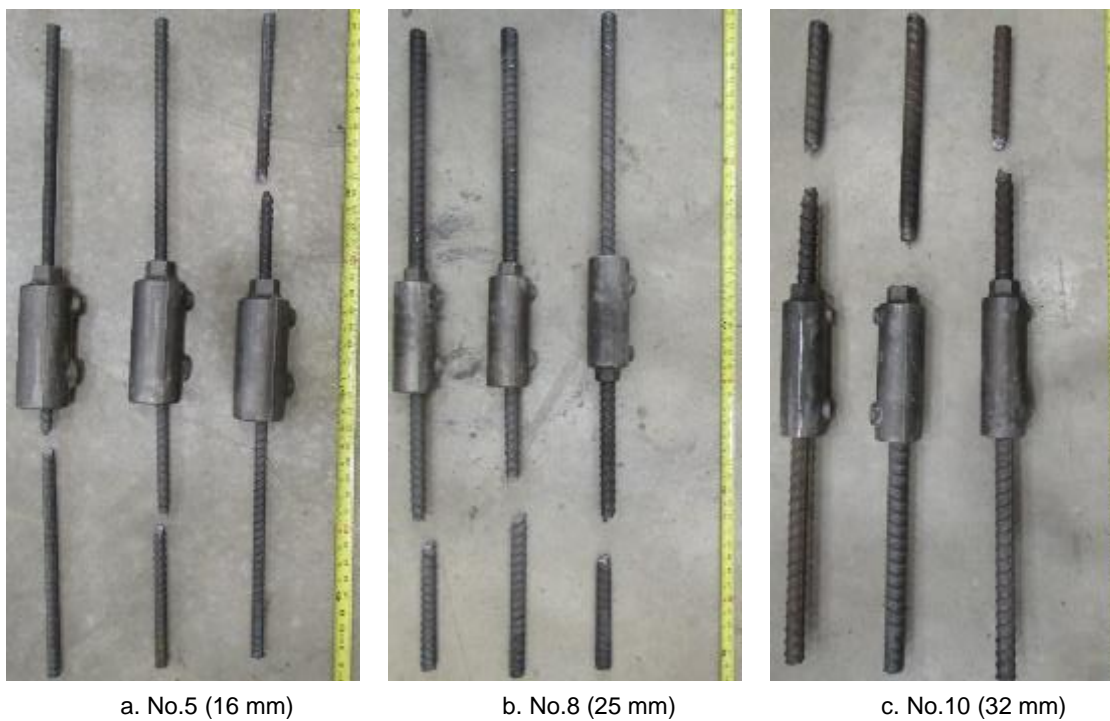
Failure of grouted-threaded hybrid couplers under cyclic loading
